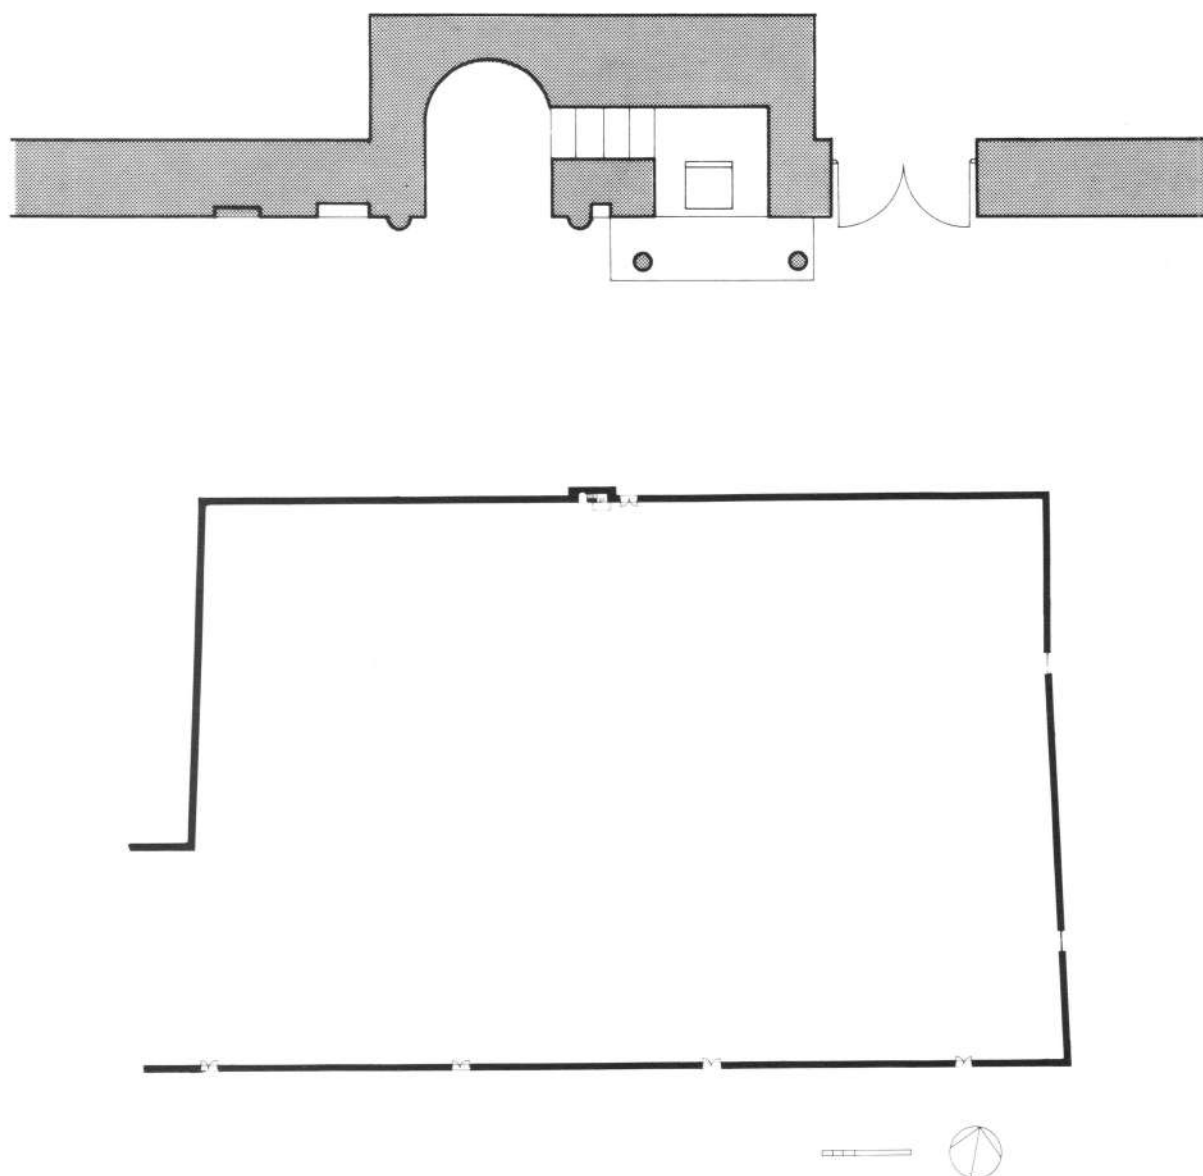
Al-Jabbānah. Plan and detailed plan of the centre of the *qiblah* wall.
